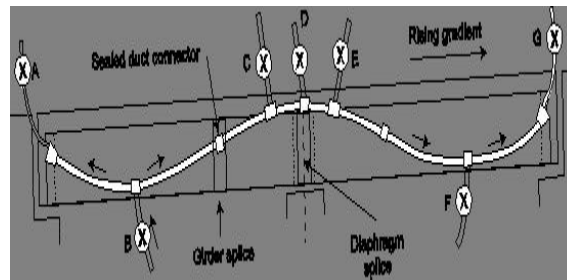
Grouting details for a 2-span spliced girder duct system
